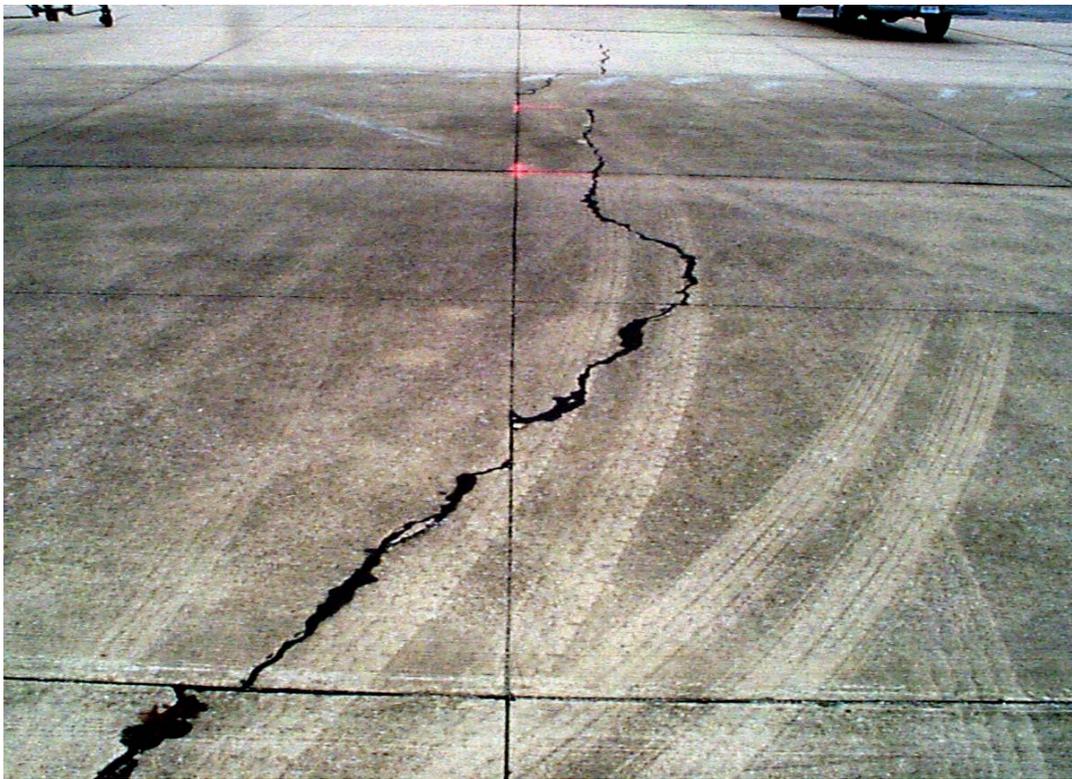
PCC Transverse Crack Reflected From Underlying Slab
